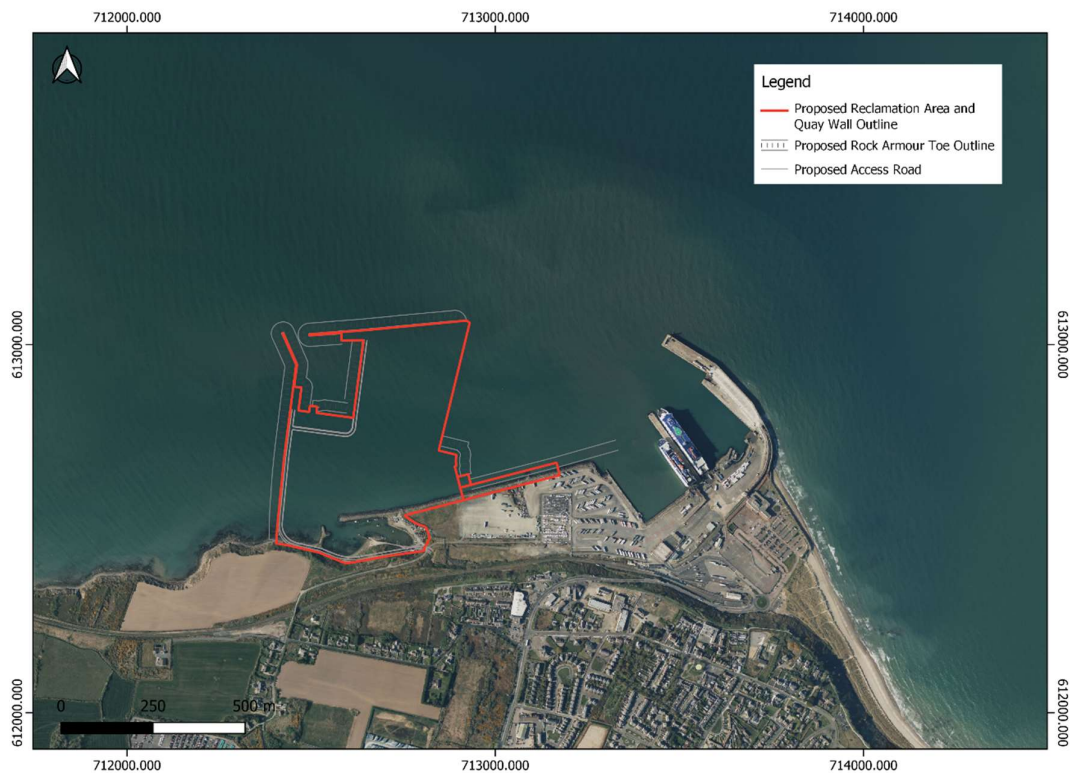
Aerial image looking towards the Rosslare port and ORE Hub development site (outlined in red) from south (Bing Aerial, 2024)
